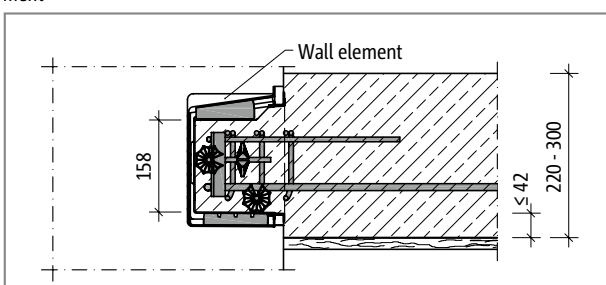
Schöck Tronsole® type Z: Wall element as stay-in-place formwork; underside of the landing lower than the connection frame of the wall element
